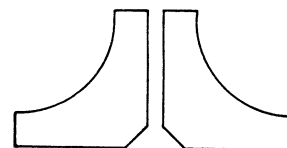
Two sections of moulding complying with design S 20 of BS 1186-3
